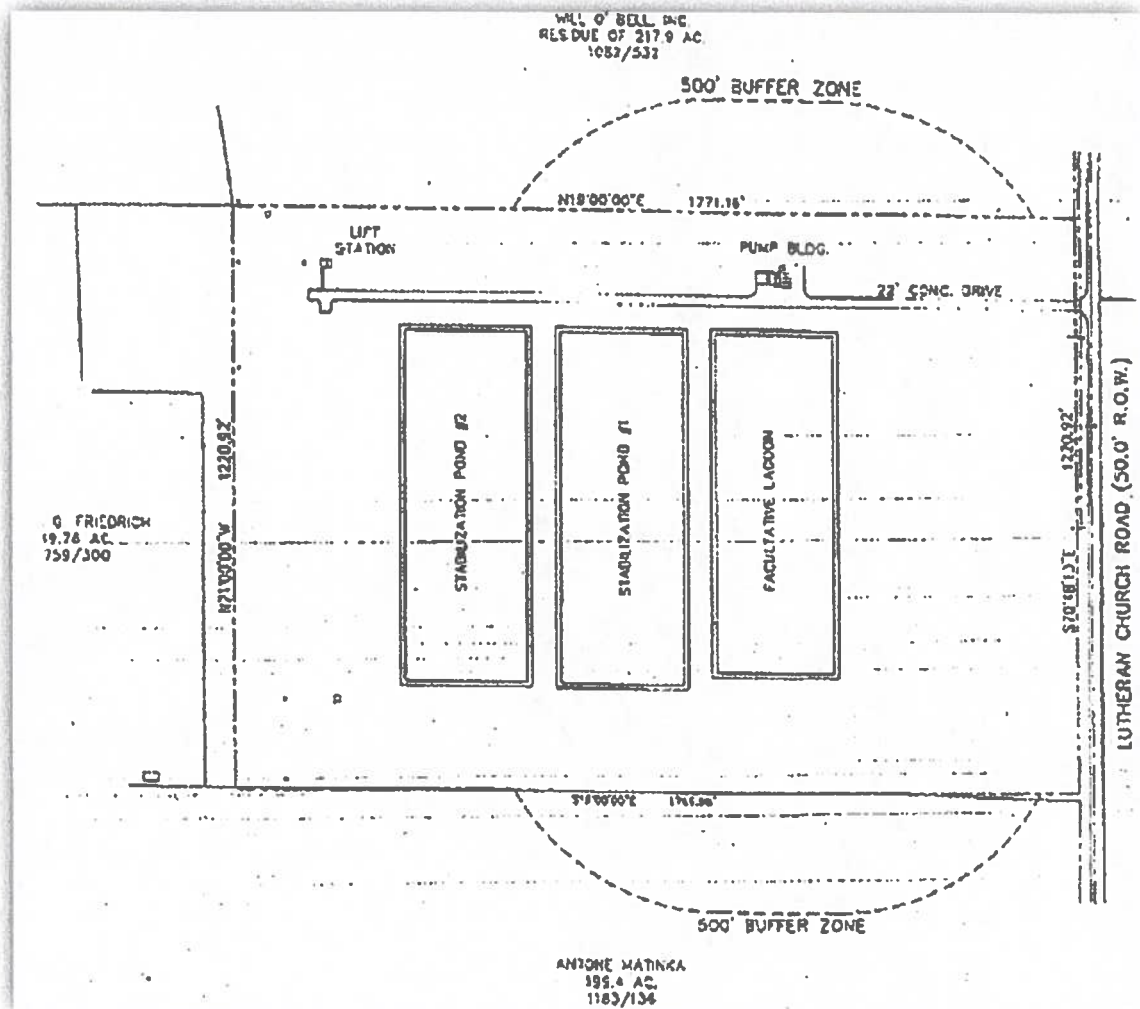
City of Bartlett's Wastewater Treatment Plant Site Plan (From TCEQ Discharge Permit)
